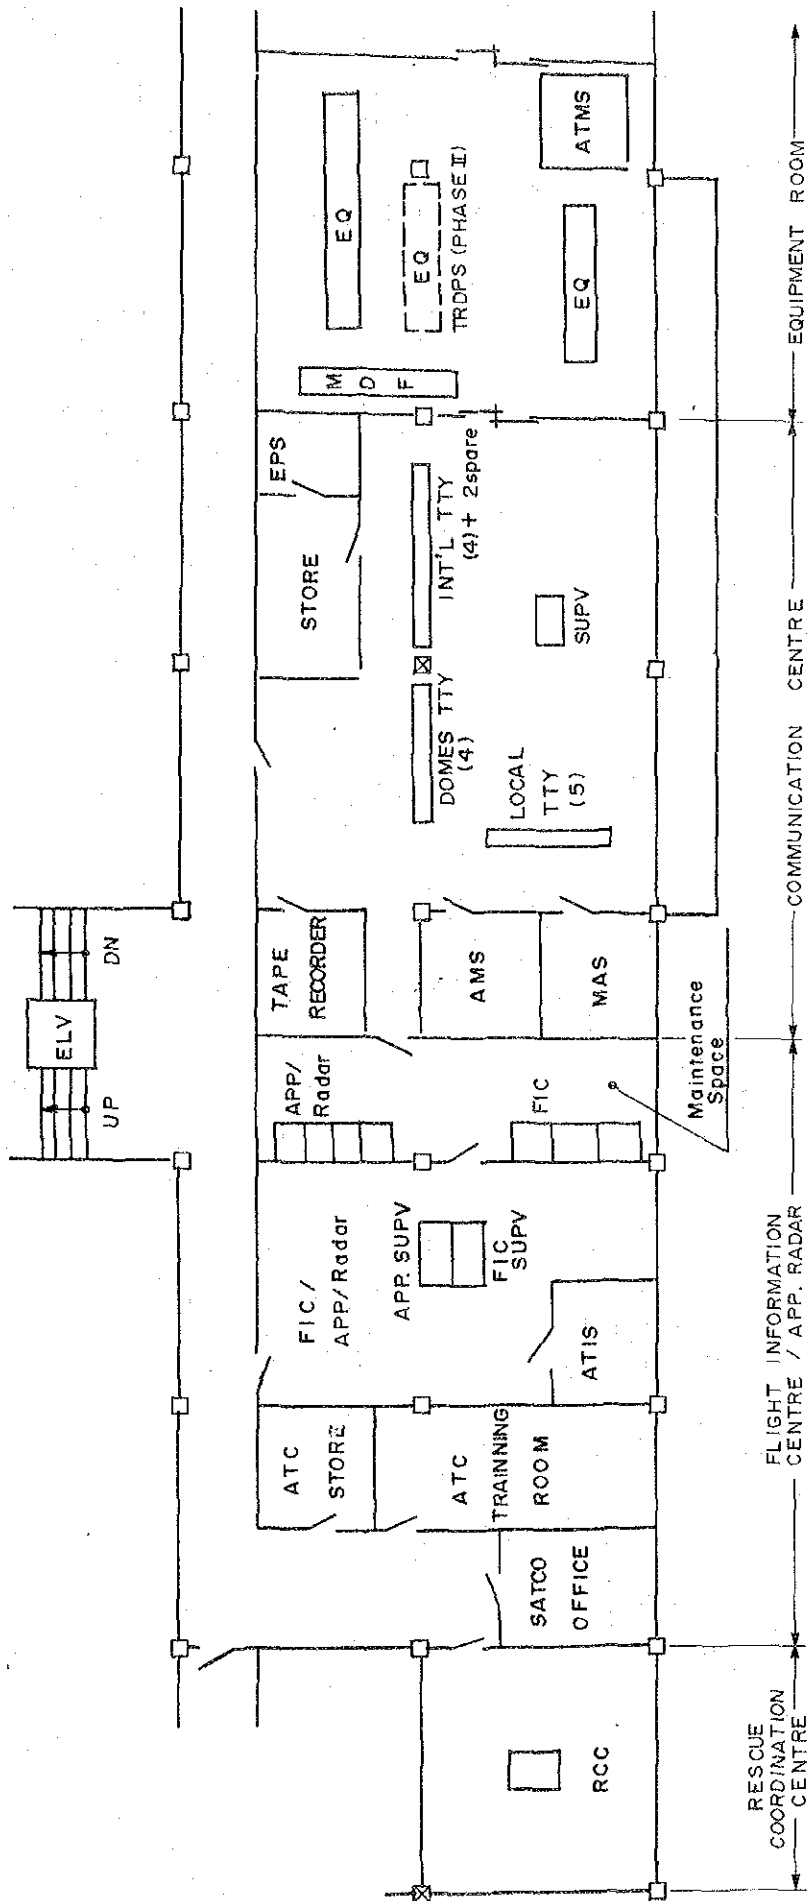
Floor Layout Plan of Flight Information Centre and Communication Centre, etc. (2nd Floor of Control Building)
